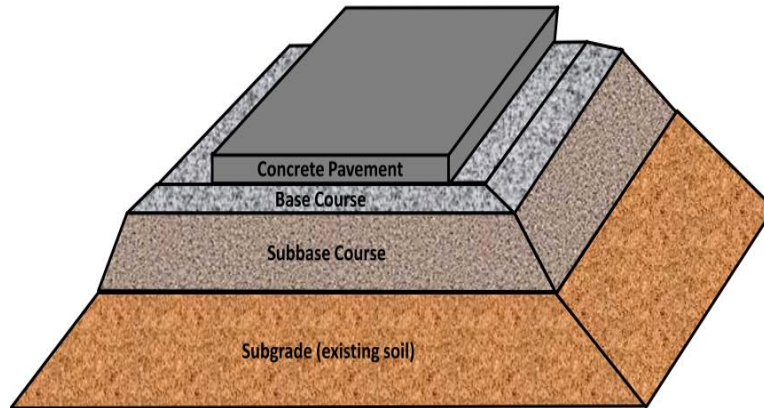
Concrete pavement support layers (Hein et al., 2017).
